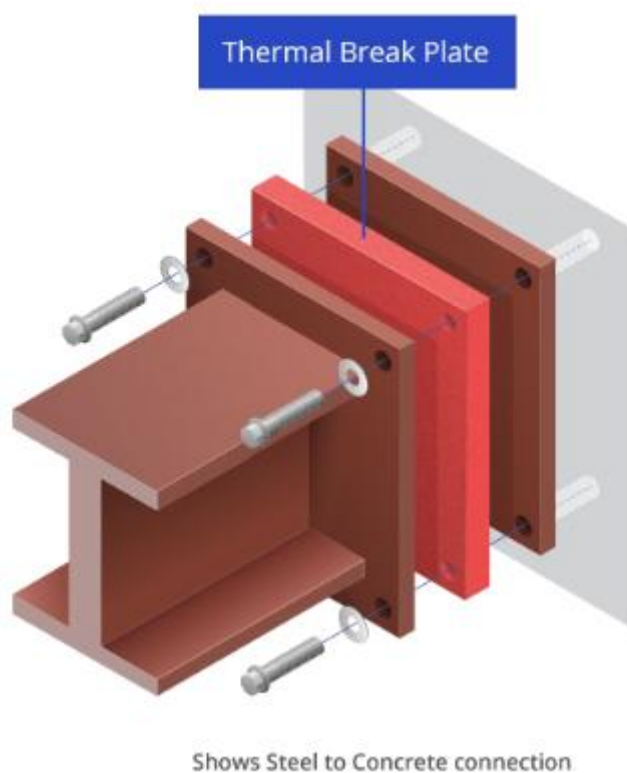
Thermal Breaks Ltd thermal break plate between steel and concrete
